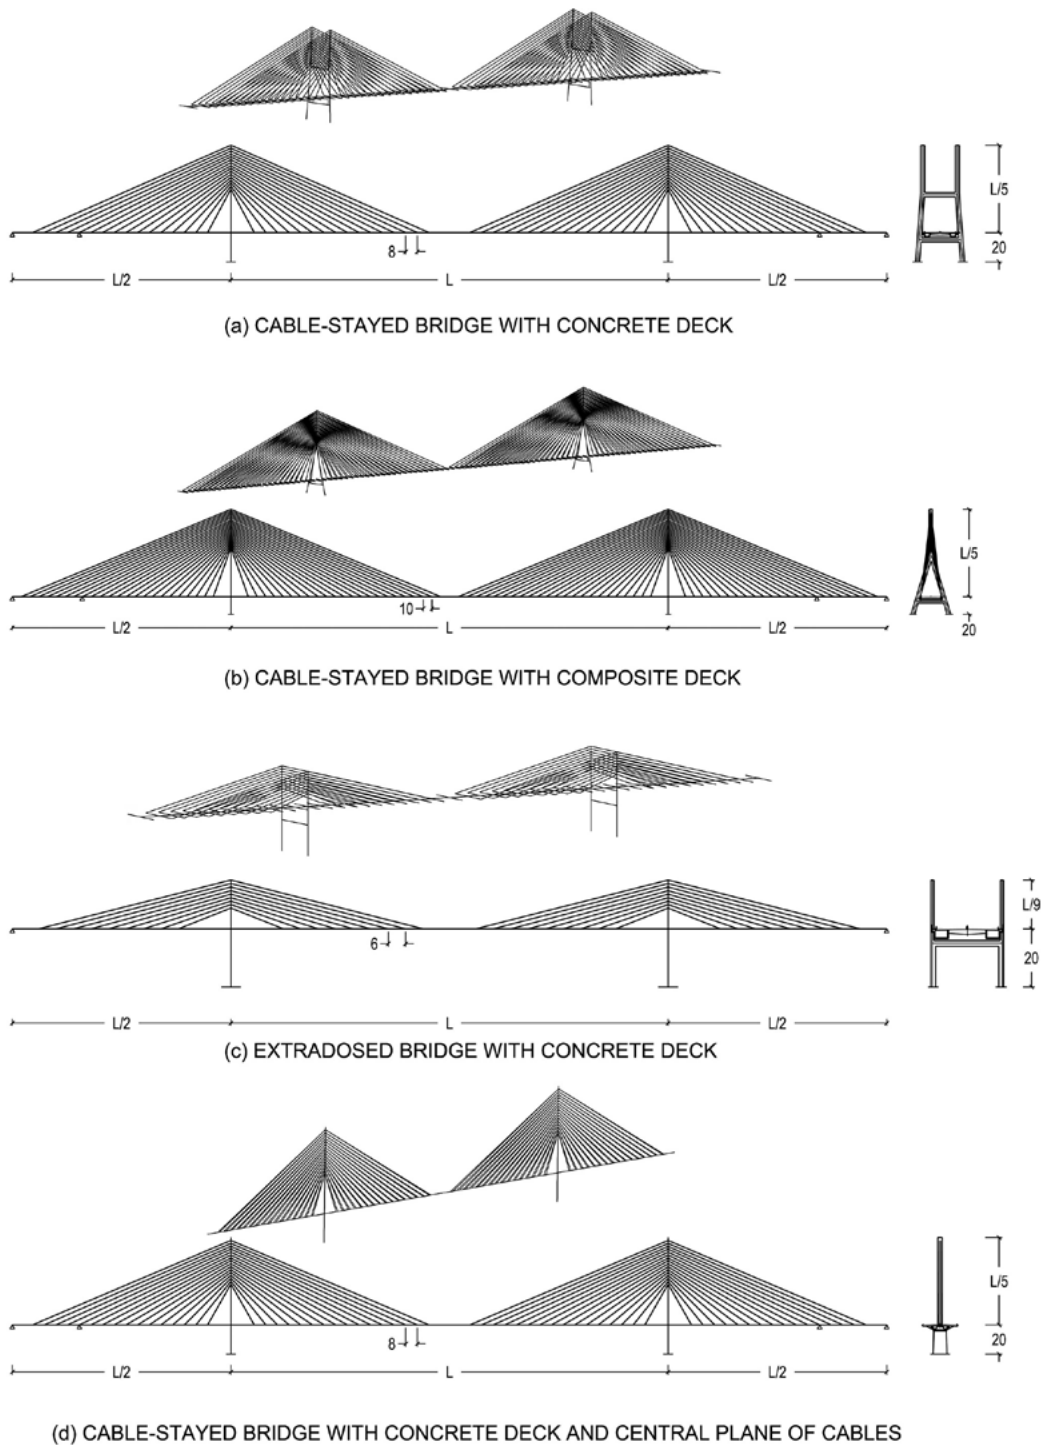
Layout and models for: a) Cable-stayed bridges with concrete deck (CS-CONC), b) Cable-stayed bridges with composite deck (CS-COMP), c) Extradosed bridges with a concrete deck (EX-CONC) and d) Cable-stayed bridges with concrete deck and central plane of cables (CC-CONC).
